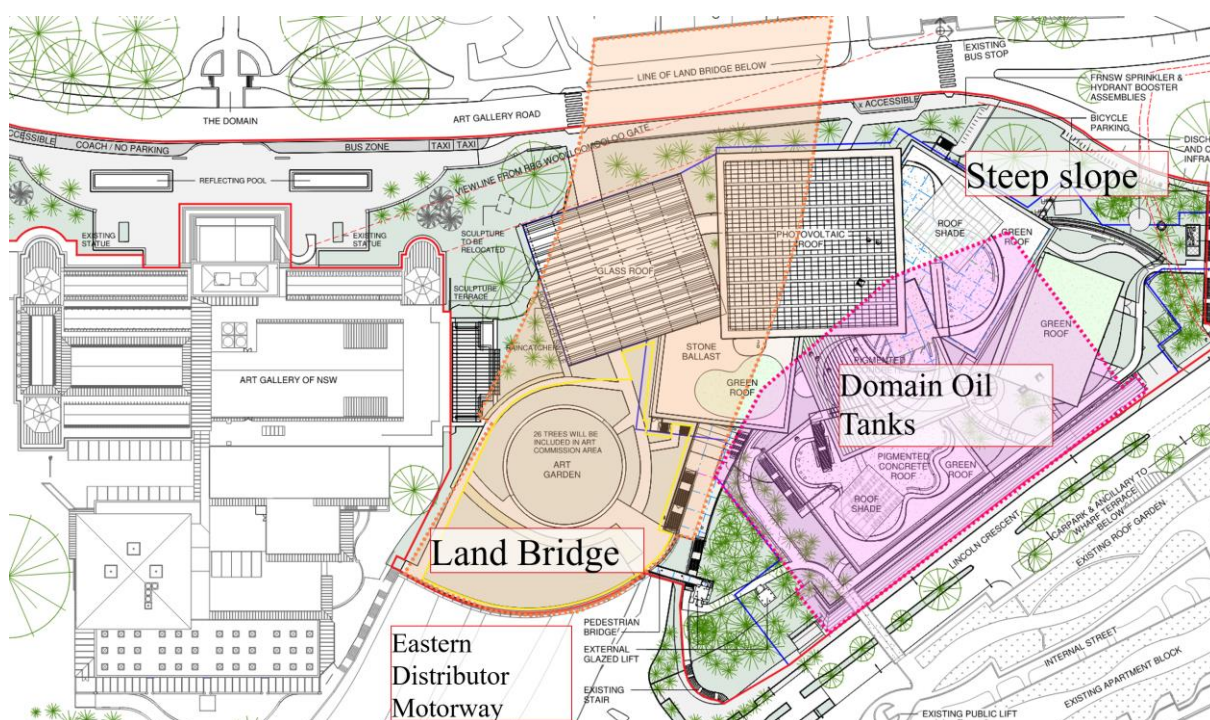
Site plan showing footprint of new building (blue outline) over existing structures; Eastern Distributor land bridge on left and fuel tanks on right. Arup, based on drawing by SANAA.
